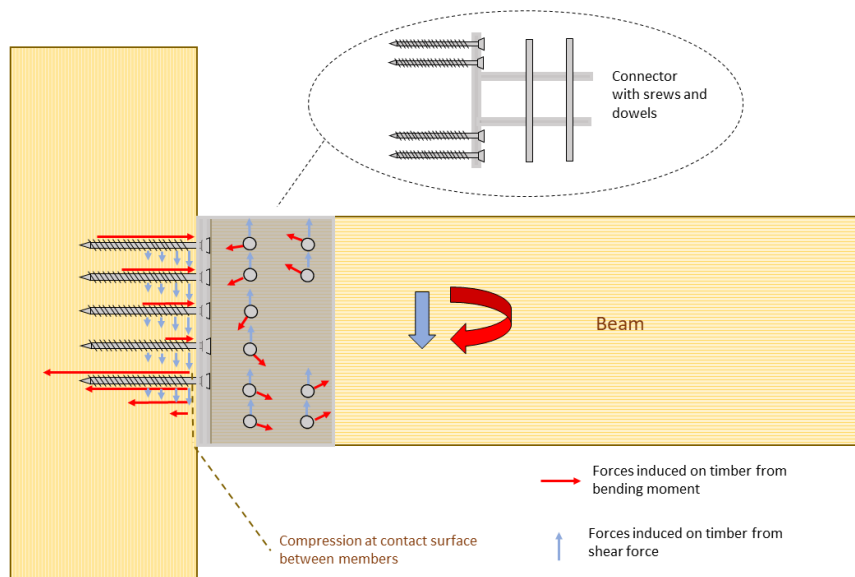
Conceptual figure of a semi rigid beam to column connection loaded with shear and moment and what forces that then can be induced in the embedding timber and in the fasteners
